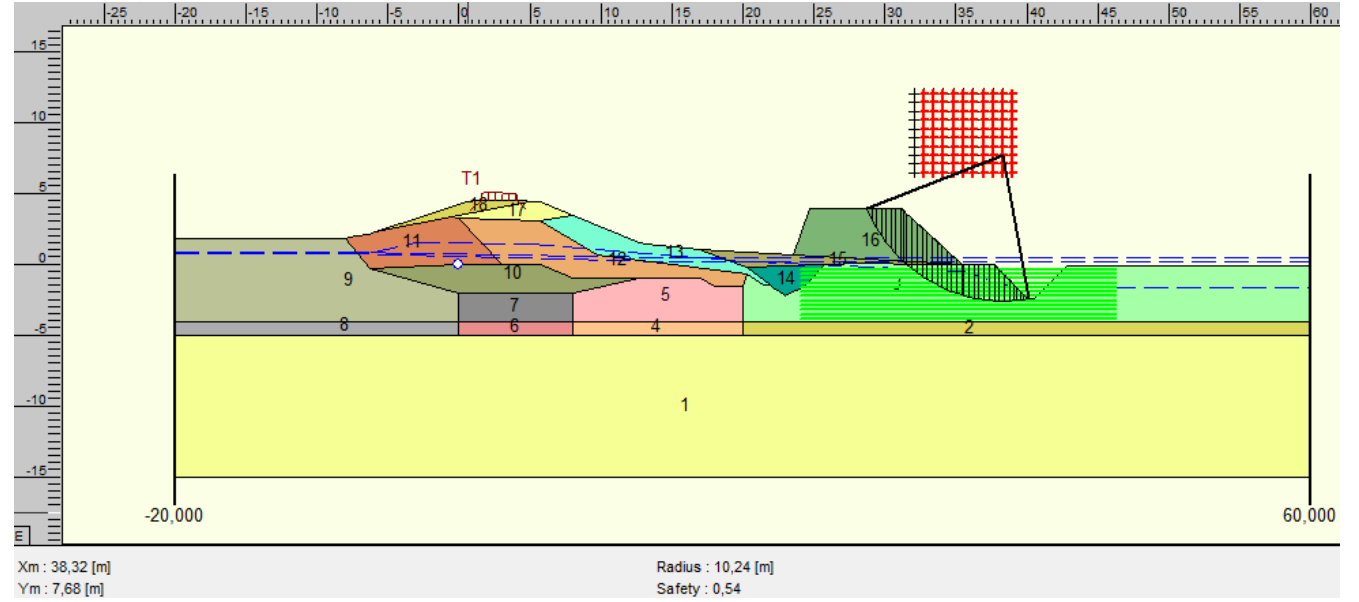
D-Geo Stability Results. Observation Water Level 95%, NAP + 0.82 m + Construction Load 95%, 4 m Height and 2 m from Ditch
